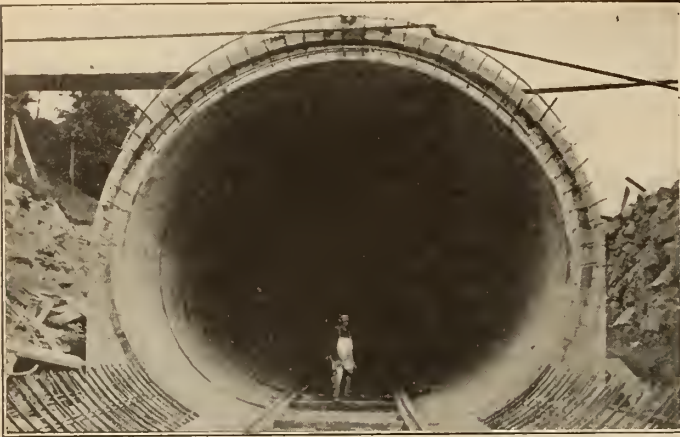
Reinforced Concrete Pipe of Oblate Section.
